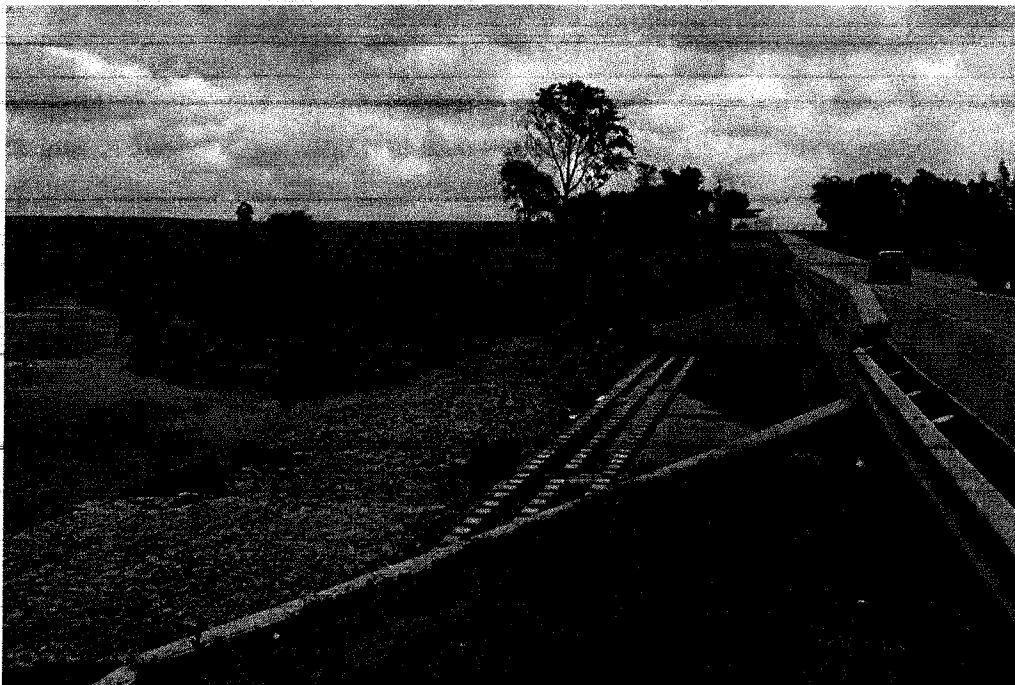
Installation of baffle structures and gabion mattress at Site C1UNSP-SPITS downstream of the bridge crossing to prevent downstream erosion and plunge pool formation
